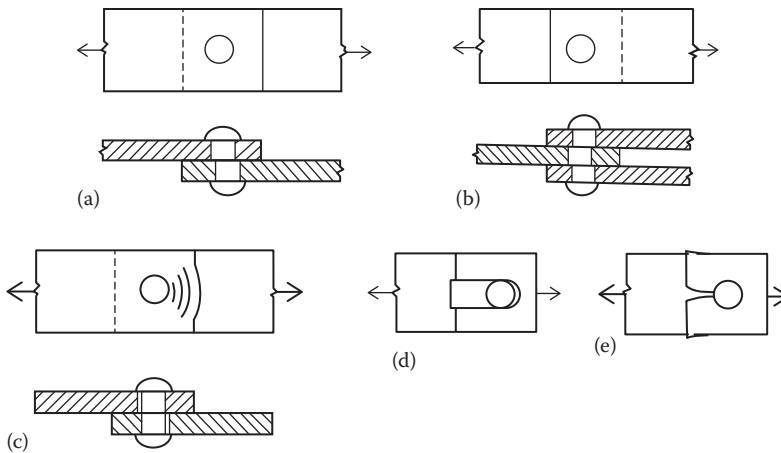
Failure mode, bolted connection: (a) bolt single-shear failure, (b) bolt double-shear failure, (c) bearing failure, (d) plate edge failure, and (e) transverse tension failure.
